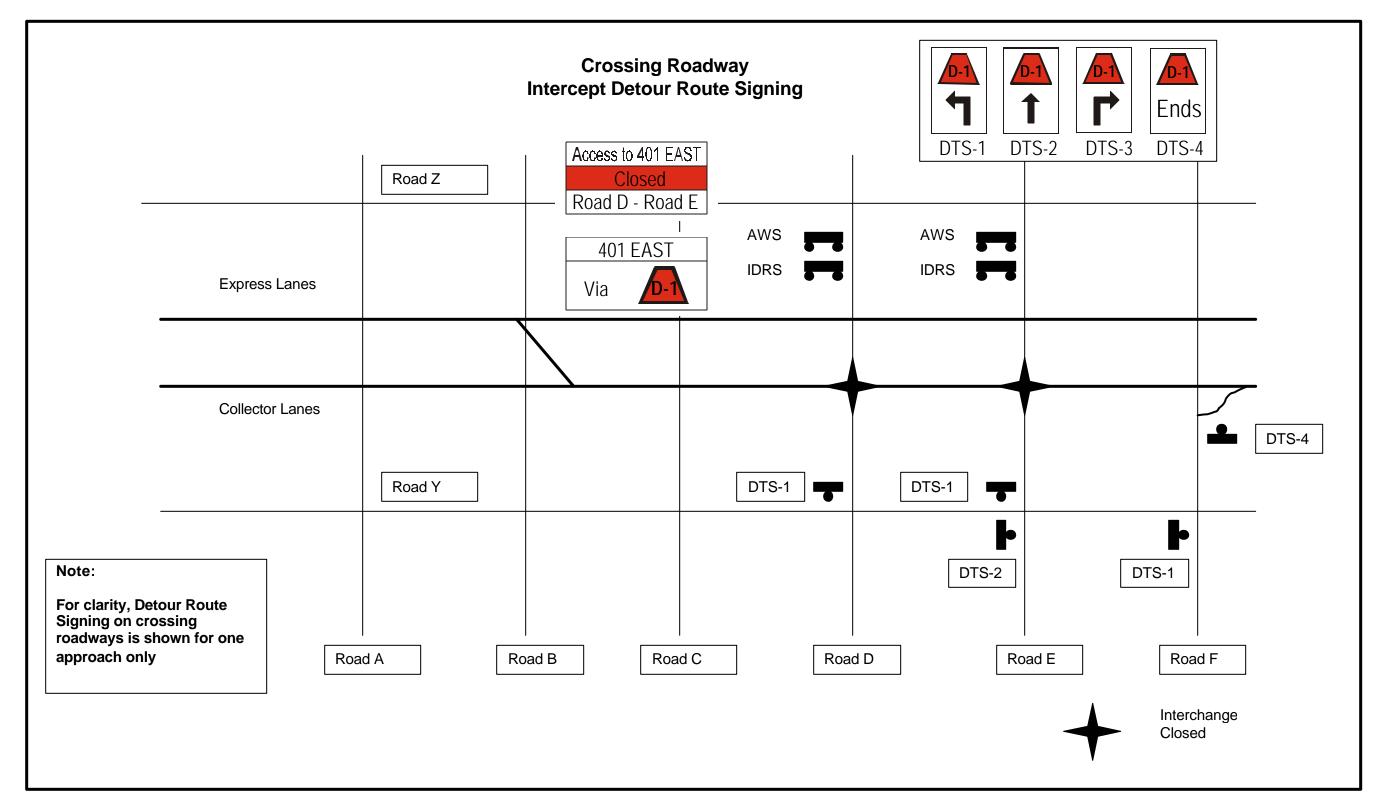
Crossing Roadway - Intercept Detour Route Signing
